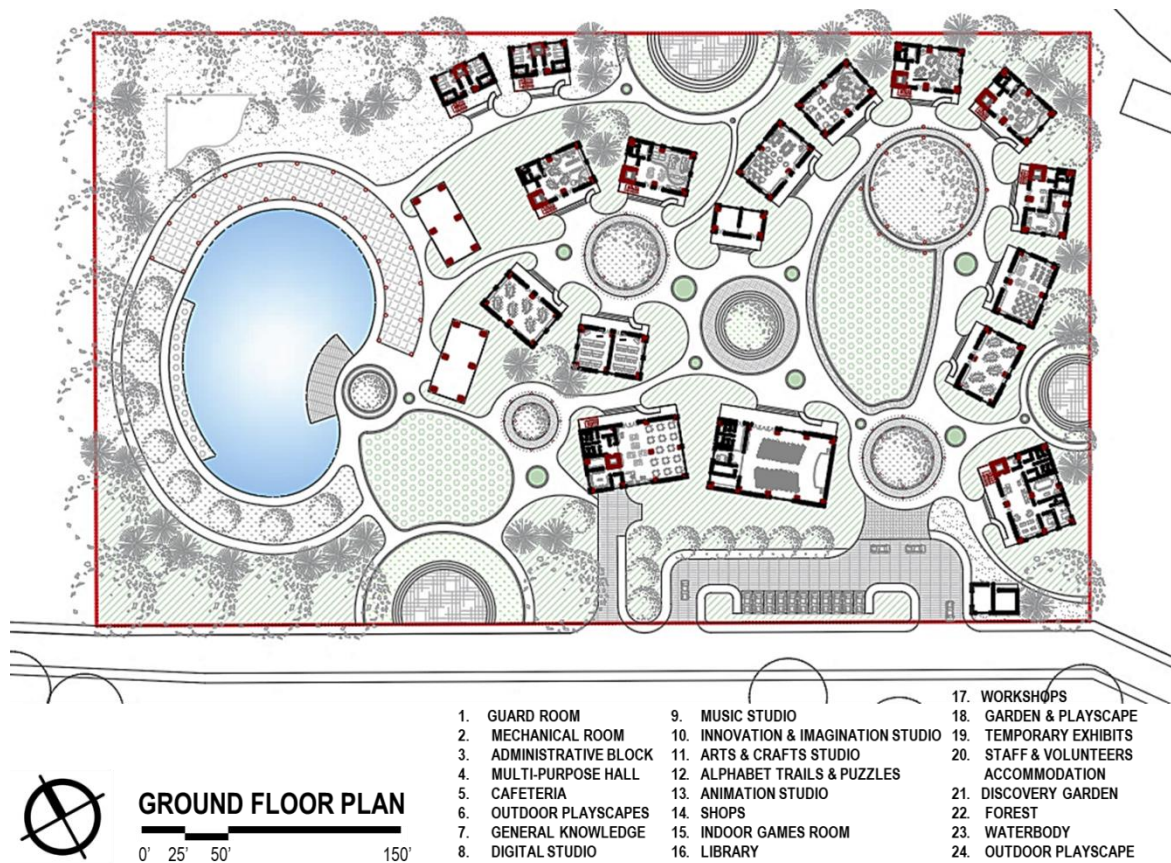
Ground Floor Plan ;(Source: Author, 2020)
